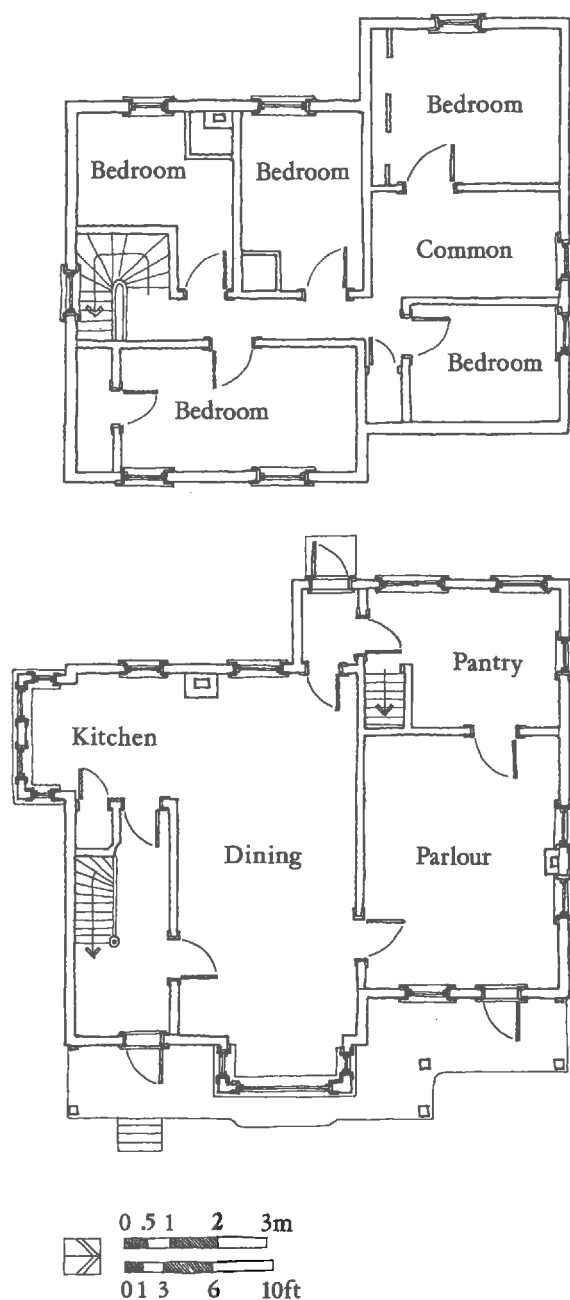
Top, second floor plan, and below, ground floor plan, of the Souter house.
